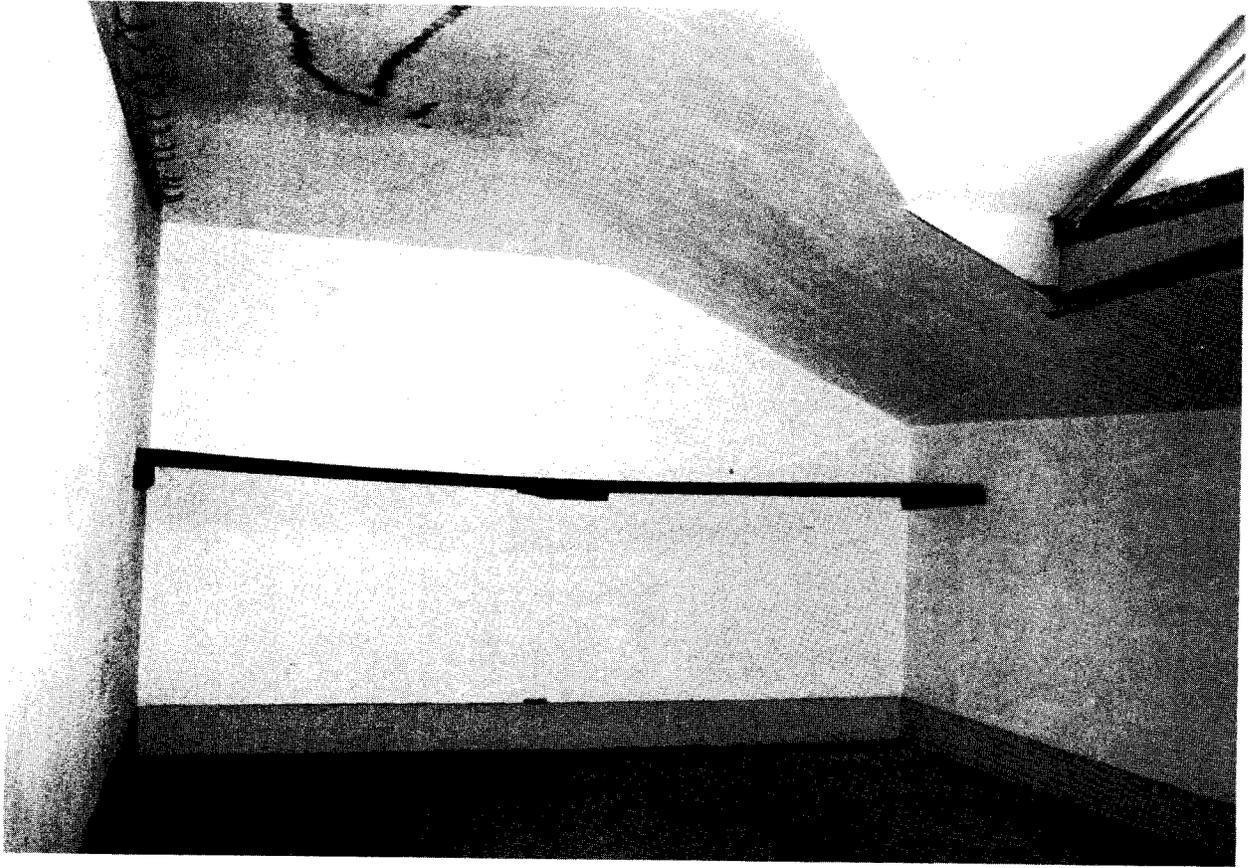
Penniman House: Finished Attic Space (Room 302),
